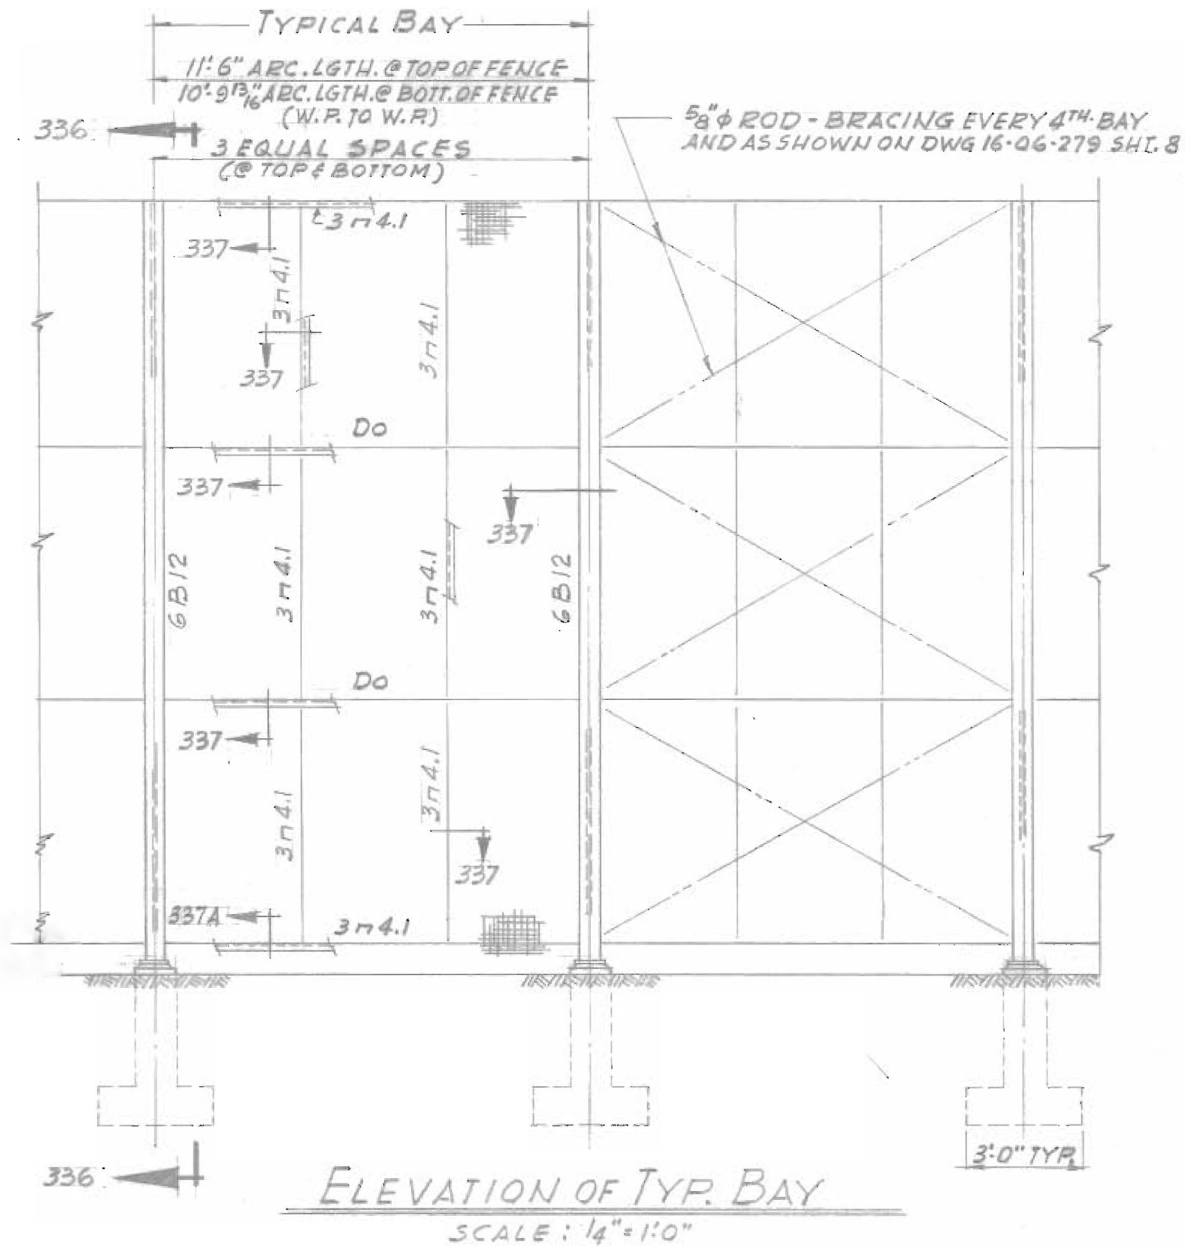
Property 23659, typical fence section from 1961 WS-KD plan set.
